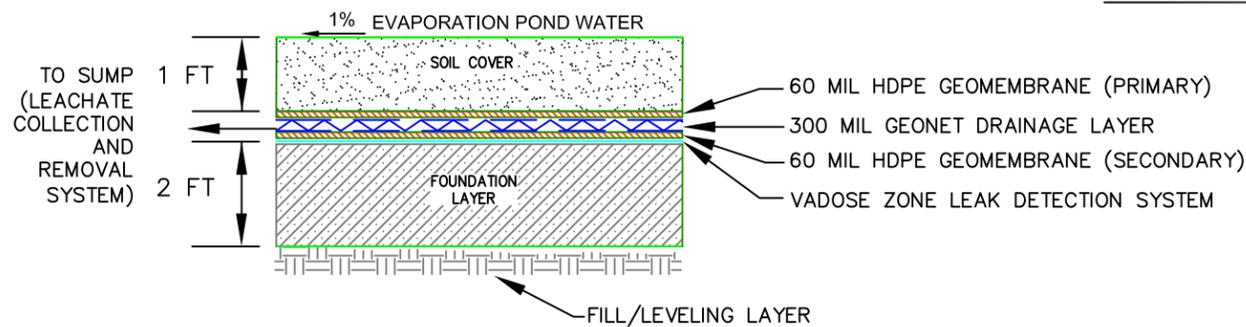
DETAIL D - TYPICAL ECO-CAP - SOIL CAP
